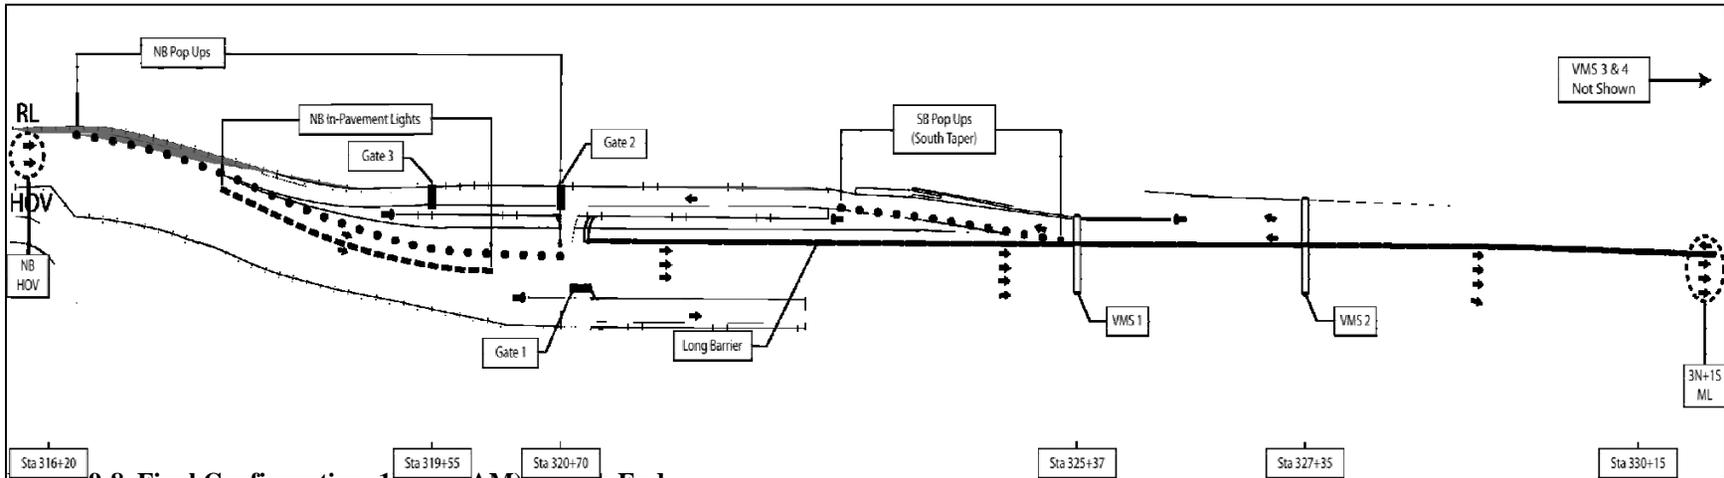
Final Configuration: 1N+3S (AM) - South End
